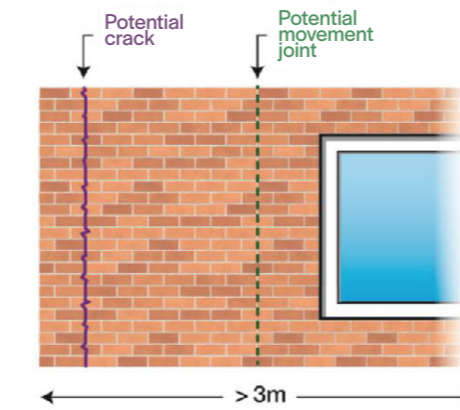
Corners are very stiff joints. A run of brickwork more than half the minimum allowance can lead to cracking near the corners.
